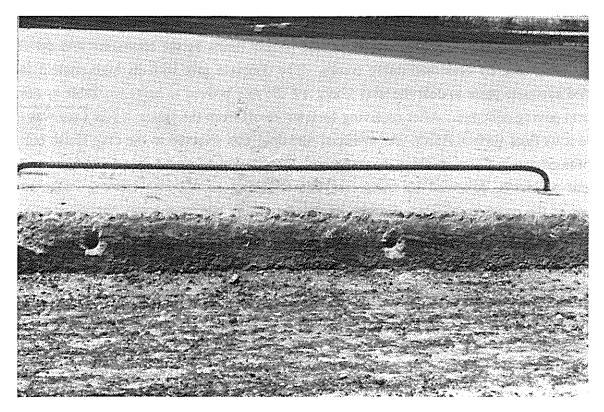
Edge bonding-reinforcement bars were no. 5 bars, four-feet long, raised two inches above the concrete.
